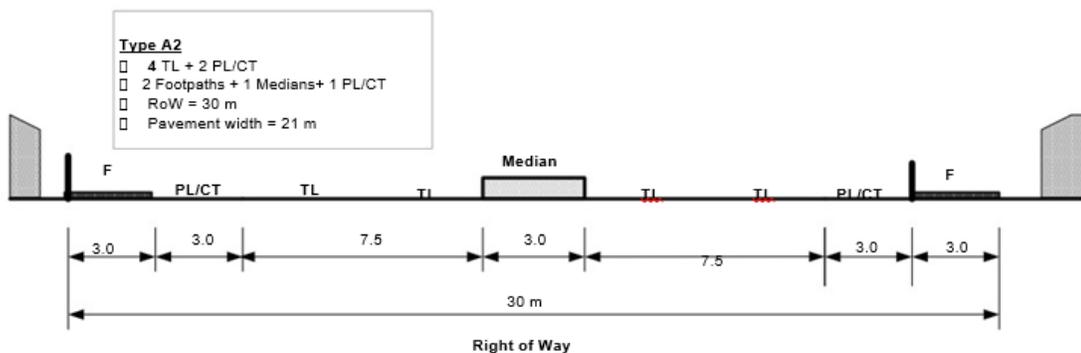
Typical cross section of Sub-arterial (Feeder Roads)
